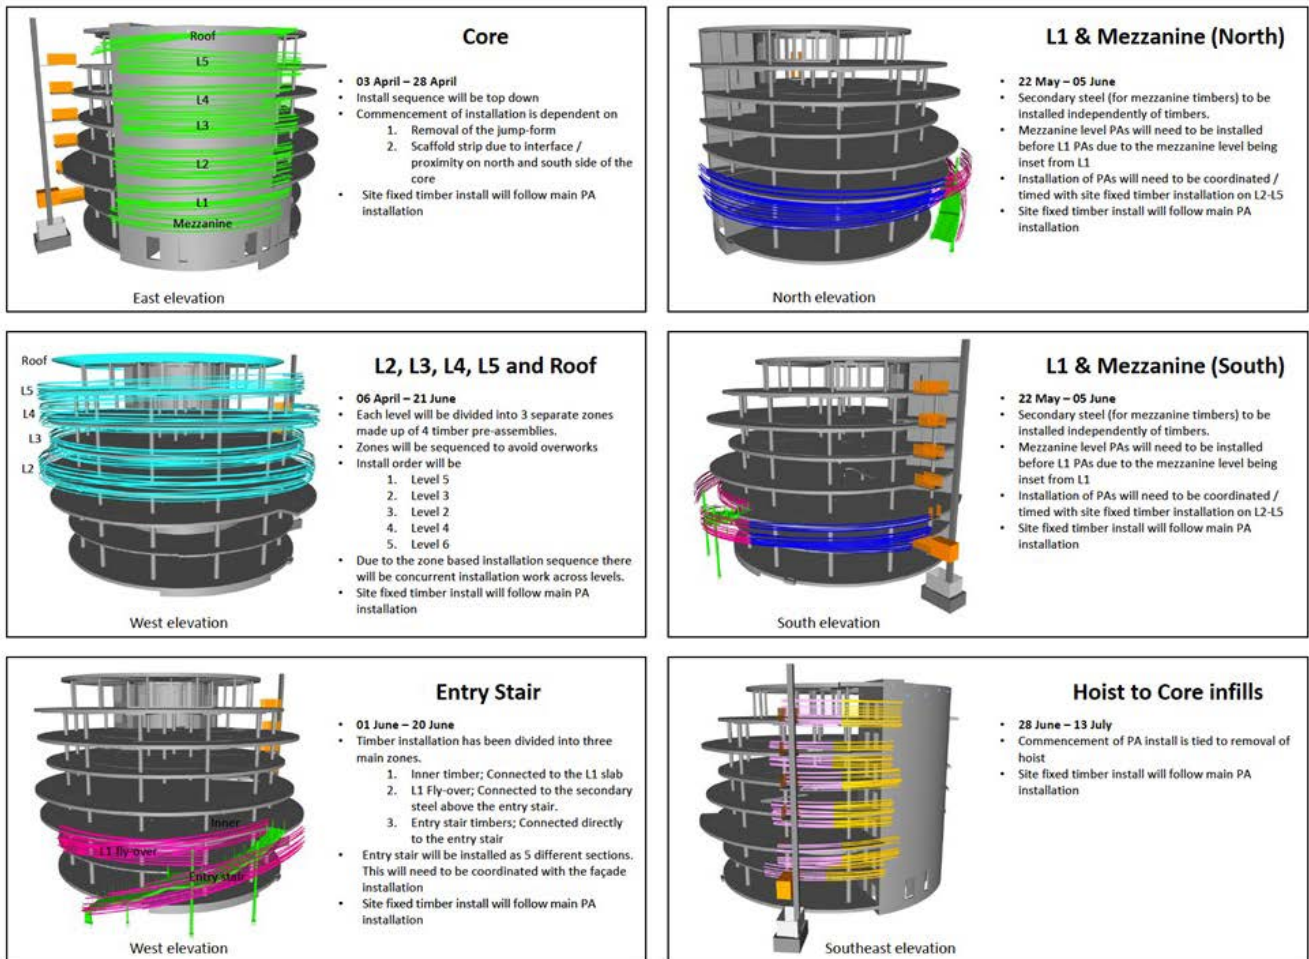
Model indicating site façade sequencing used for site communication at safety meetings.
